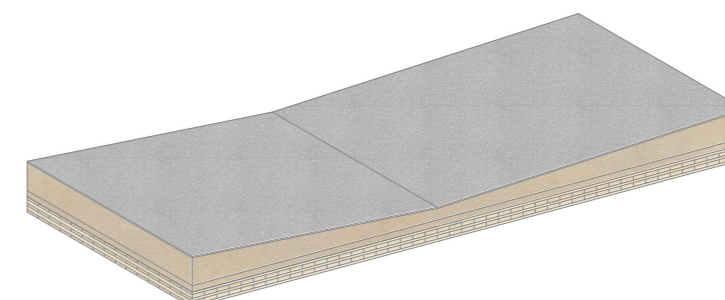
Drawing, Roof slab module. ©Personal illustration.
